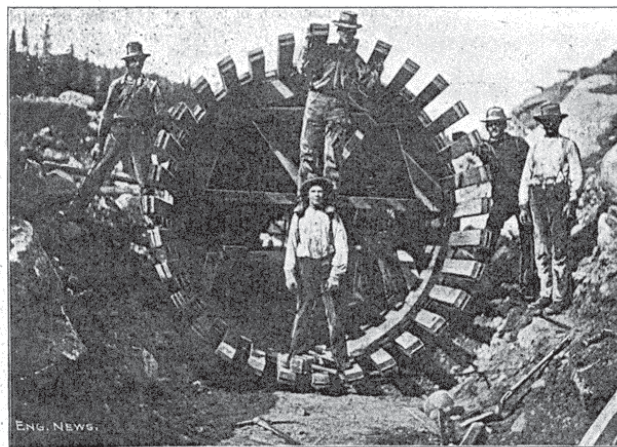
VIEW OF 9-FT. REDWOOD PIPE UNDER CONSTRUCTION, NEAR FLORISTON, CAL.
